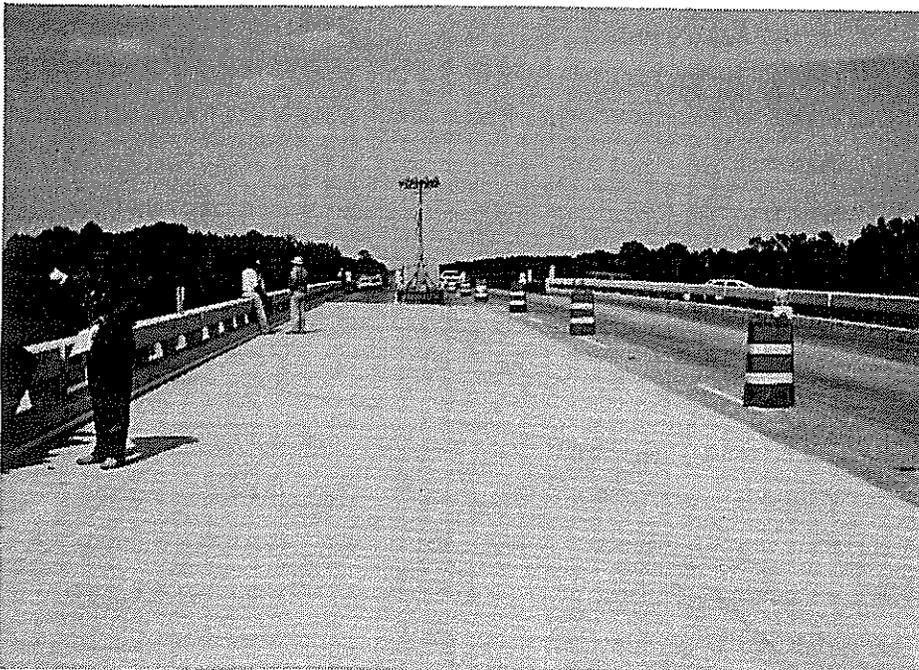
Cleaned bridge deck prior to overlay (I-20).
